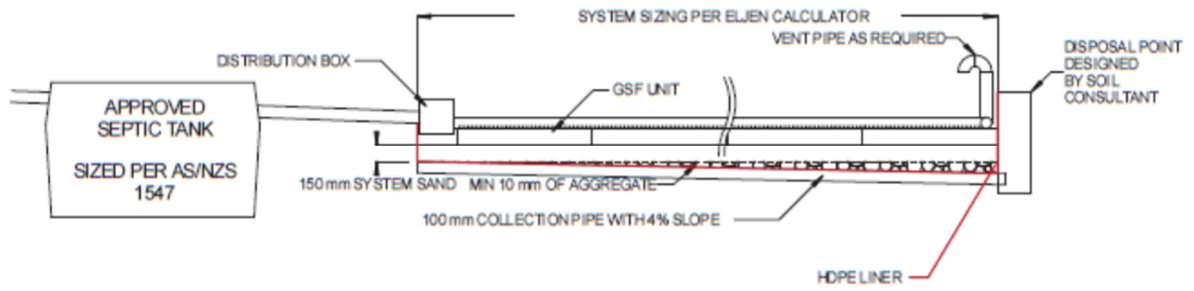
ELJEN TREATMENT BED SECTION DETAIL
